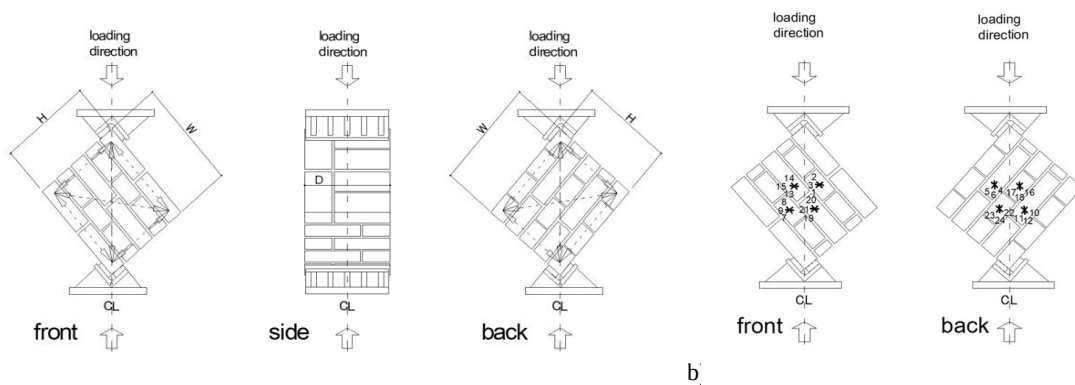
a) Diagonal compression test specimen showing transducers position b) Diagonal compression test specimen showing Rosette strain gauges
